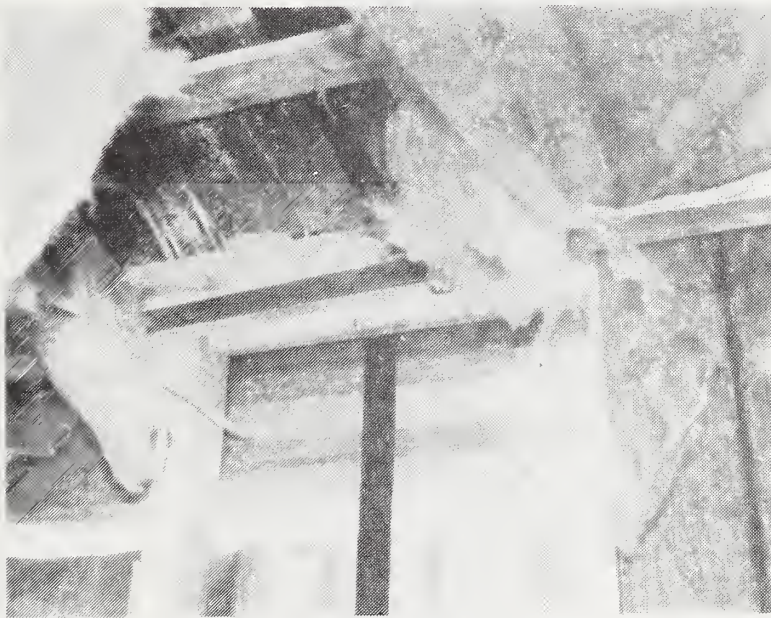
Hurricane Strap in Exposed Roof and Wall Construction
